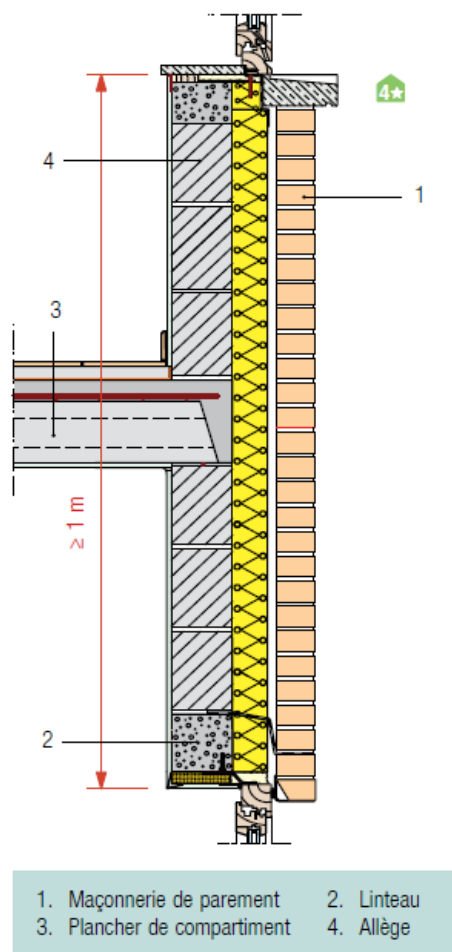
Realisation of an E 60 fire-resistant facade element in a traditional cavity wall composed of facade masonry and load-bearing concrete elements.
